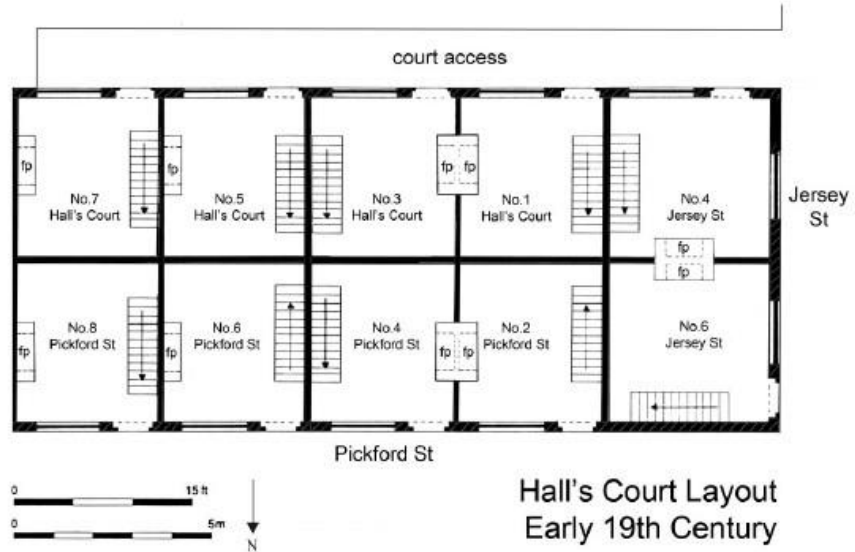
Reconstruction plan of the back-to-back house, Hall's Court. (Nevell, 2014, page 58).
